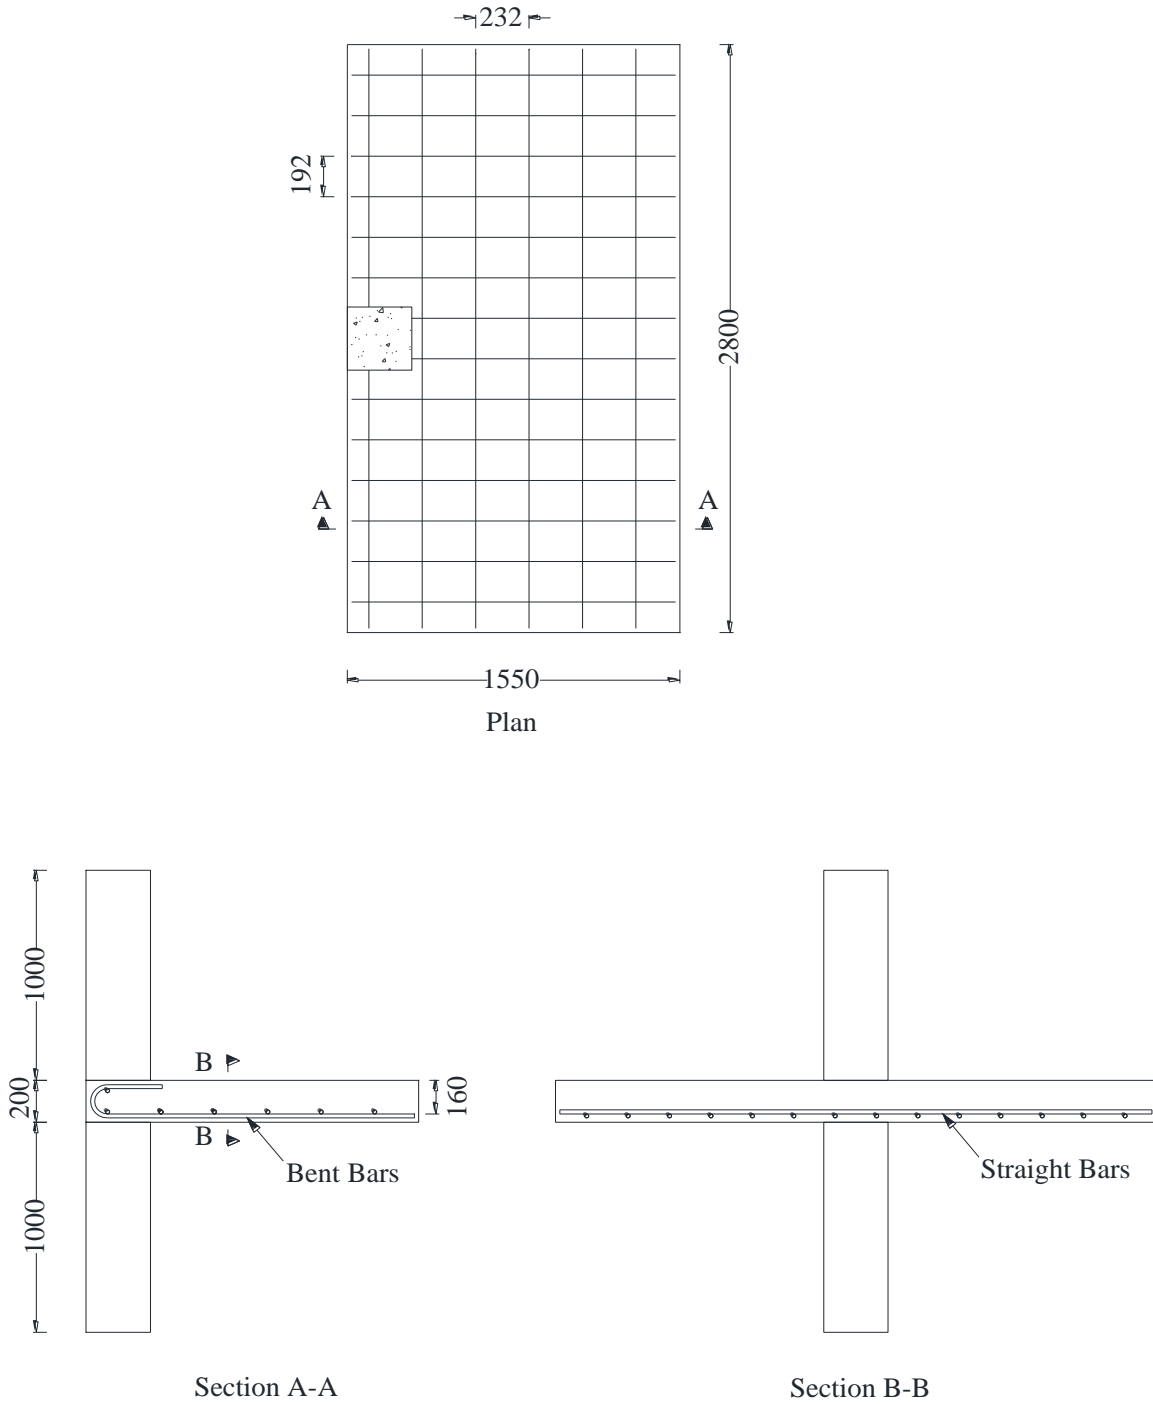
Dimensions and flexural reinforcement layout of connections with 0.9% reinforcement ratio (all dimensions are in mm)
